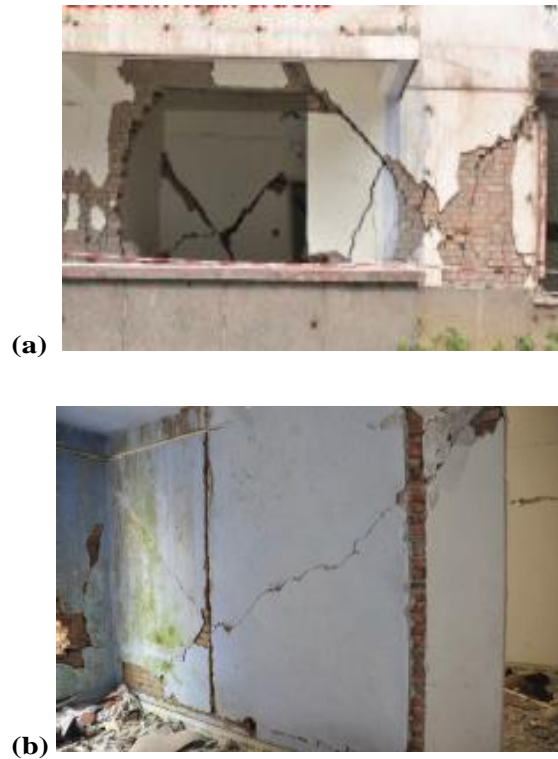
Masonry wall failures; (a) Cross cracks between openings, (b) Diagonal cracks initiated from openings [18]
